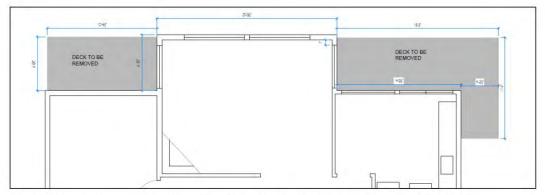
Arieal view of the proposed demolition of the existing decks. Drawings provided by Momentum Design Build.
